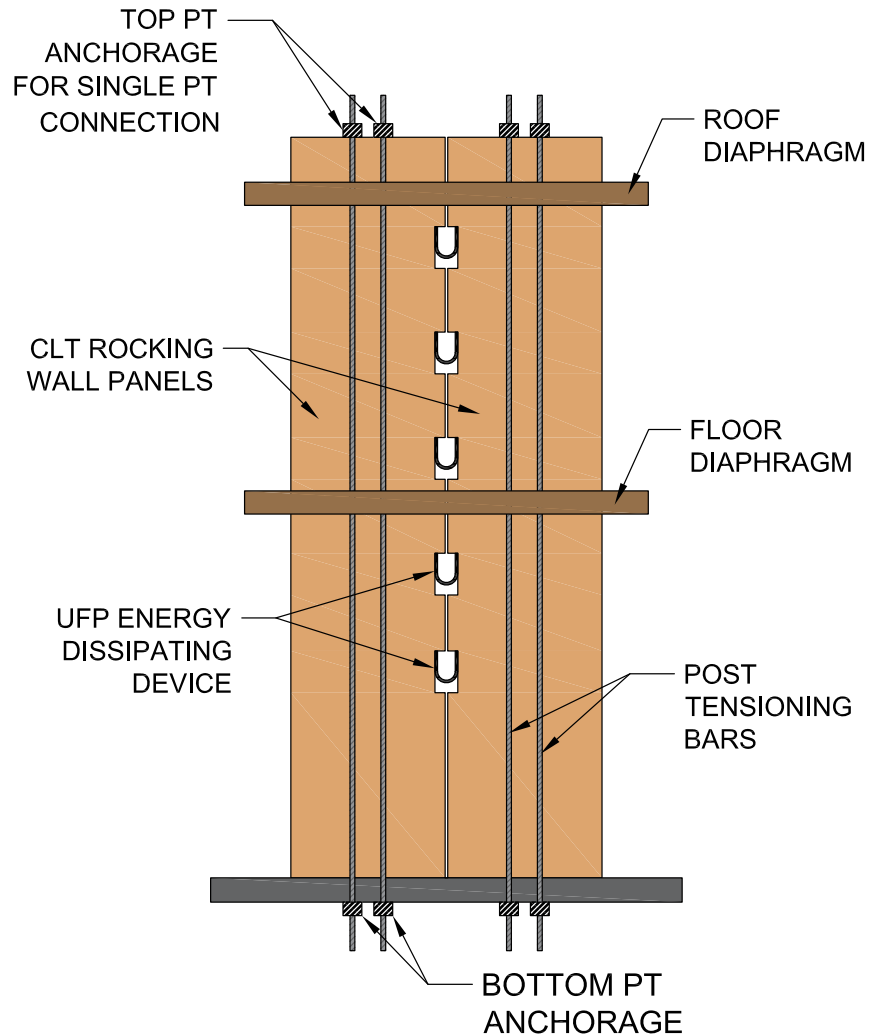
Coupled post-tensioned rocking wall schematic with single PT connection
